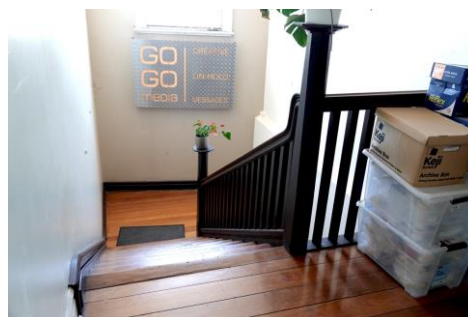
Original detailing to staircase (2023) includes pedestal-style newel posts, carved handrail, rectangular balusters and a deep skirting.
